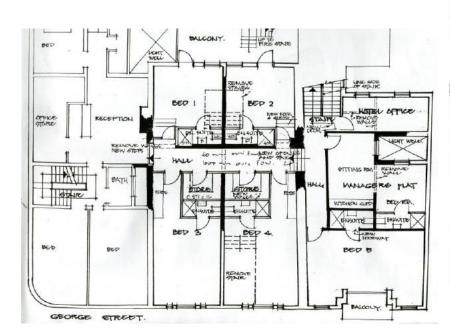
1989 works to the eastern section of 139–141 George Street, first floor plan. Source: PMNSW – ROX 410 DA 0017-DR.
